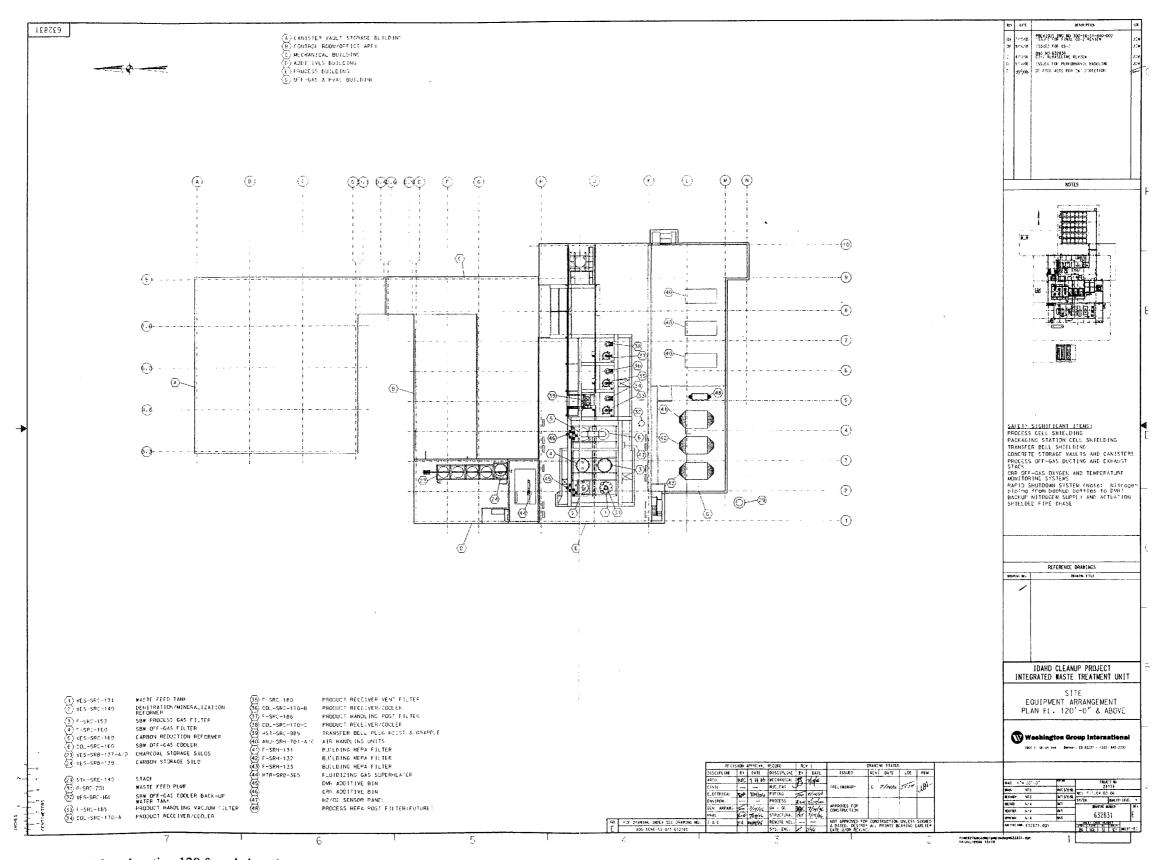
Site equipment arrangement (plan elevation 120 ft and above).
